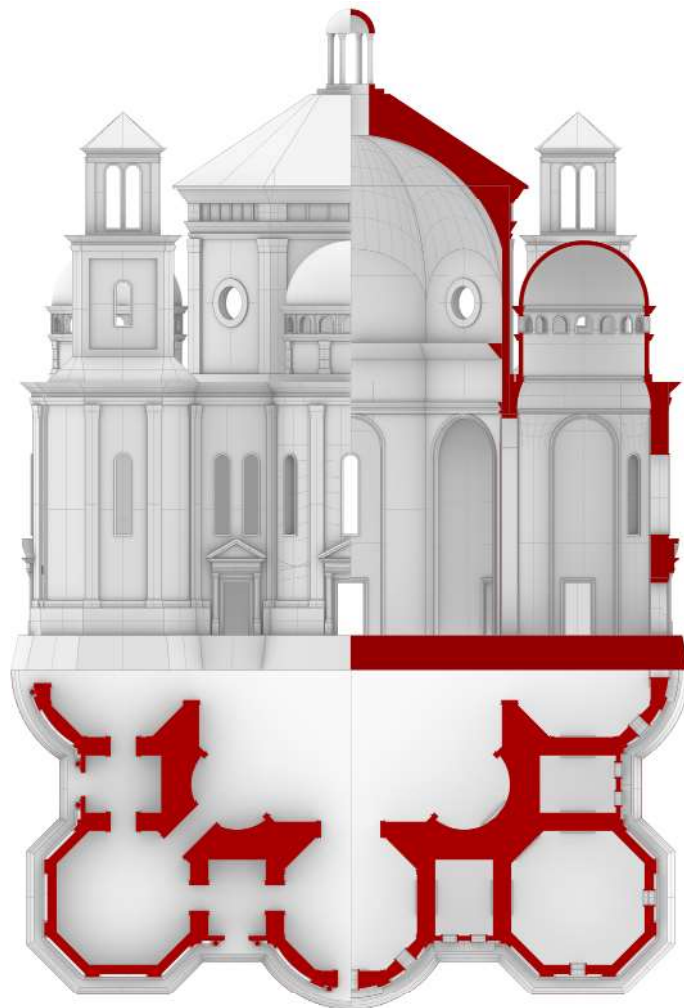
Plan, section and elevation (1:500) of one of the two solutions. The plan views are obtained by sectioning the edifice at the level of the windows (on the right) and at the level of the doors (on the left).
